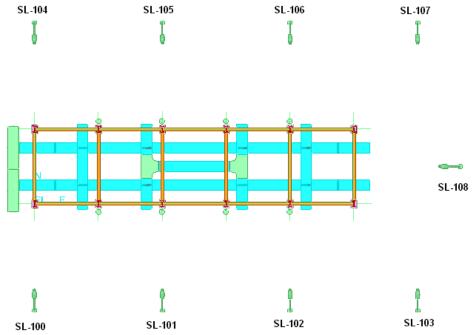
Plan View of Unit U07 - Street Lighting Fixtures
